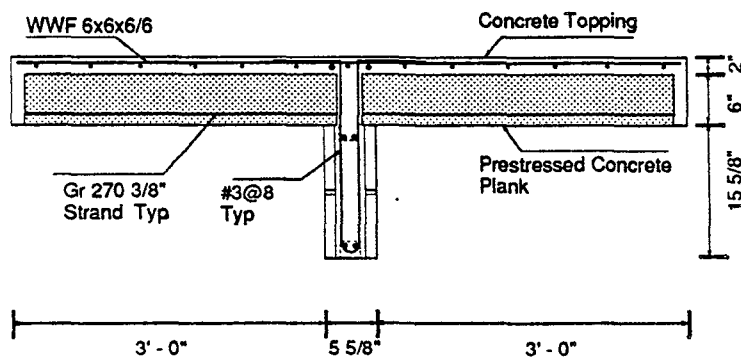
Type 1 Specimen: floor slab reinforcement detail.
